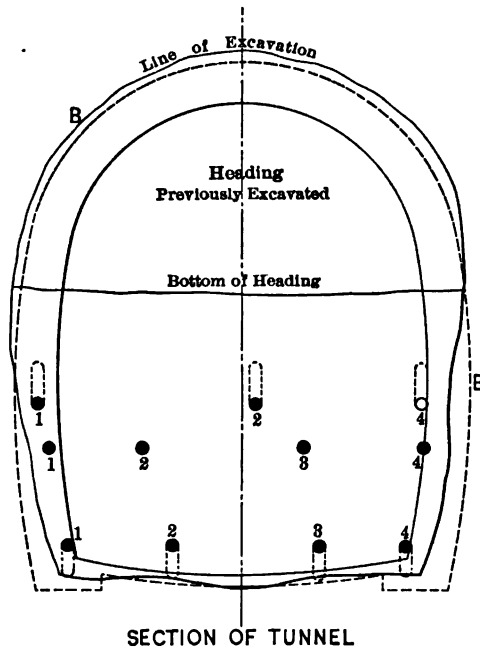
Grade Tunnel Cross-section, Showing Method of Placing Horizontal Holes for Excavating "Bench."
